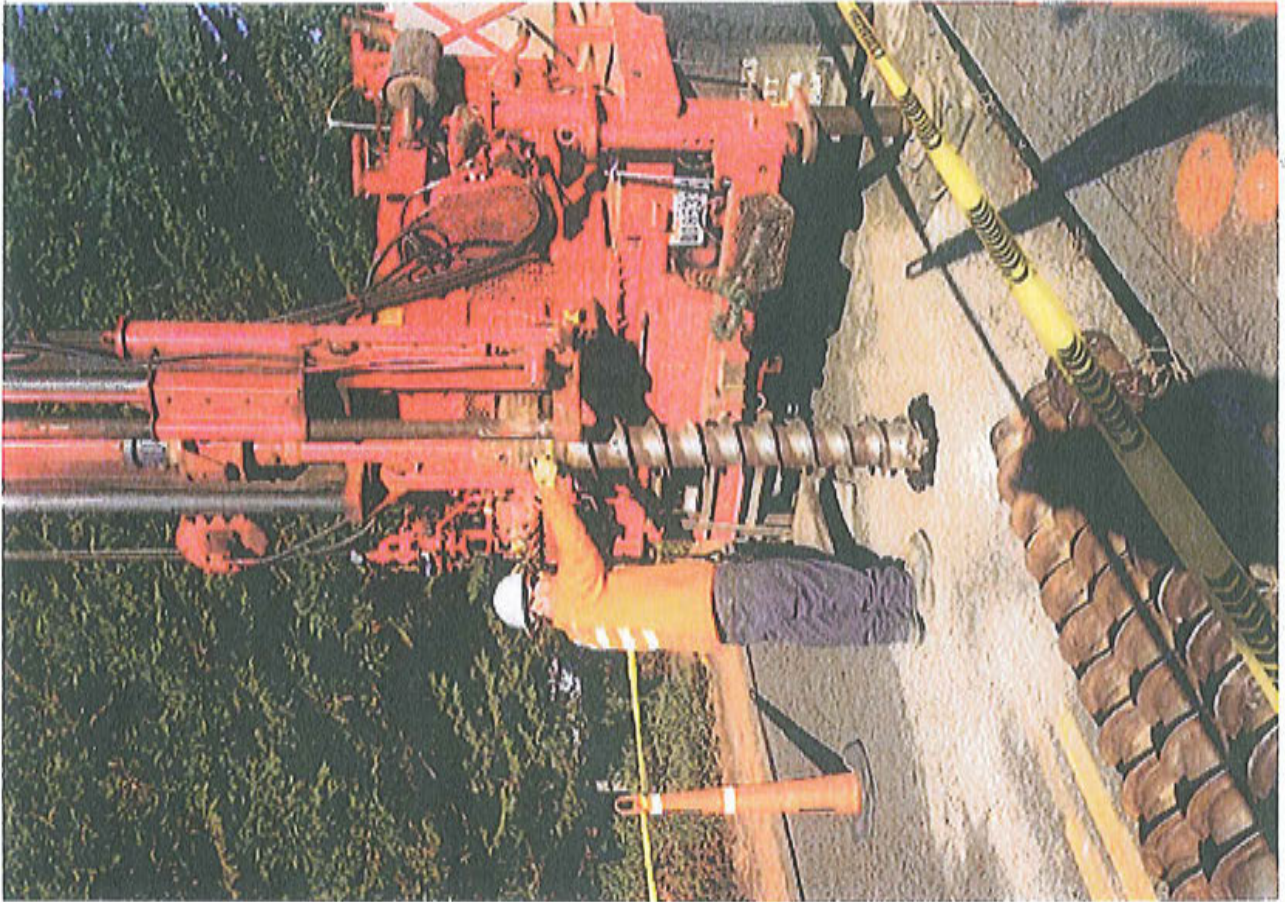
Cascade Drilling, LP is installing a new boring for groundwater testing and new monitoring well located at public right-of-way at N Northlake Place at Metro Lake Union Site.
